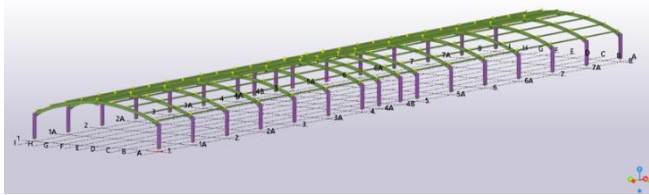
3D Model of Steel Roof Structure in Tekla Structures
